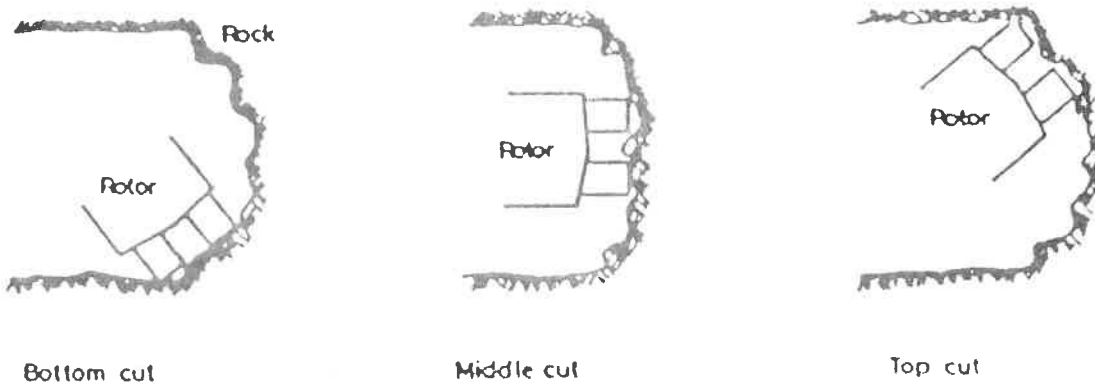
IMPACT POSITIONS USED WITH THE SWING HAMMER MINER
